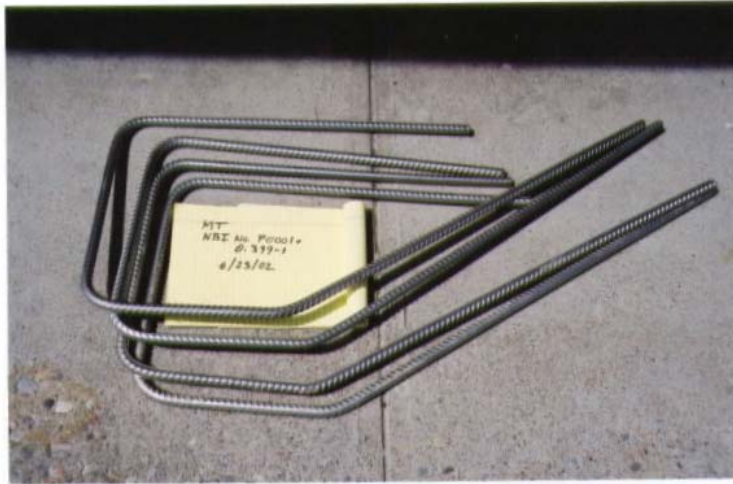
Photograph of stainless steel reinforcement details acquired from the job site.
